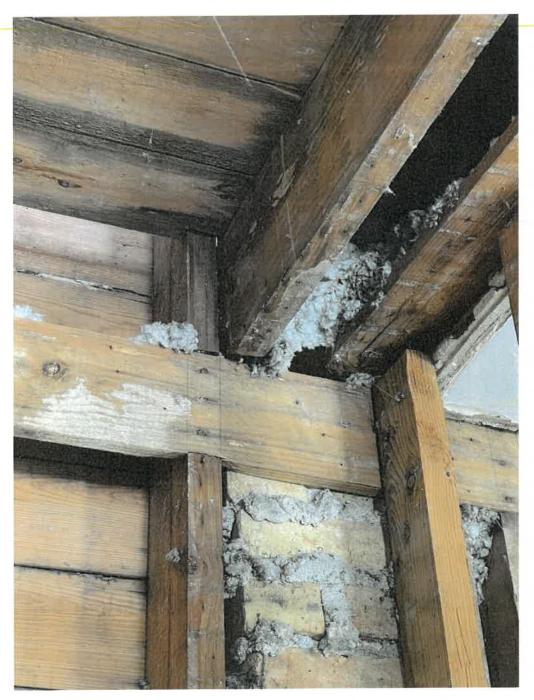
North Wing (First Floor) – Intersection balloon framing at east wall & brick masonry bearing wall, with floor joists pocketed into masonry. Staining of floor boards and framing members may indicate impregnated mold condition. Air gaps at intersection of wood framing and irregular masonry surfaces pose constructability problems for air sealing building envelope.
